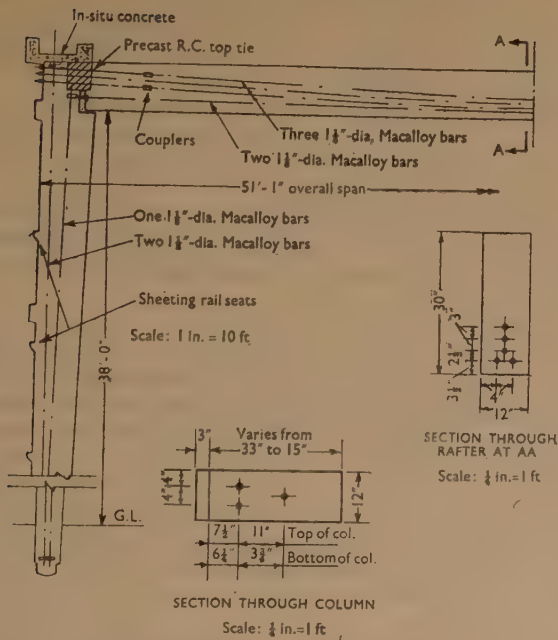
TYPICAL FRAME AND JOINT DETAIL
